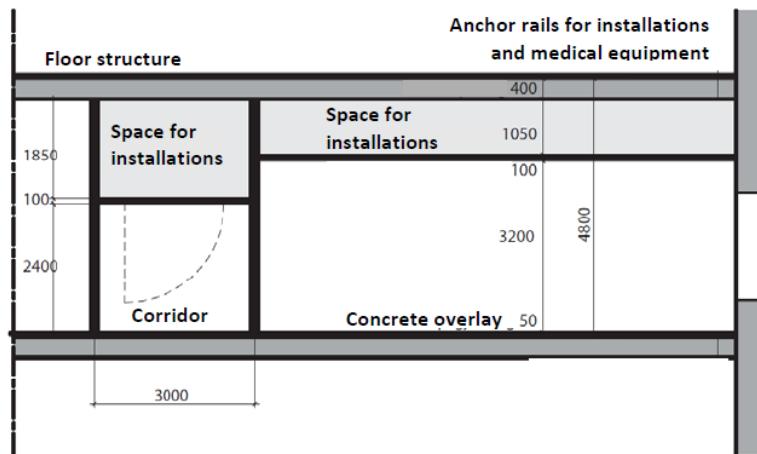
Measurement requirements on structural systems for new healthcare facilities within the Stockholm County [5].
